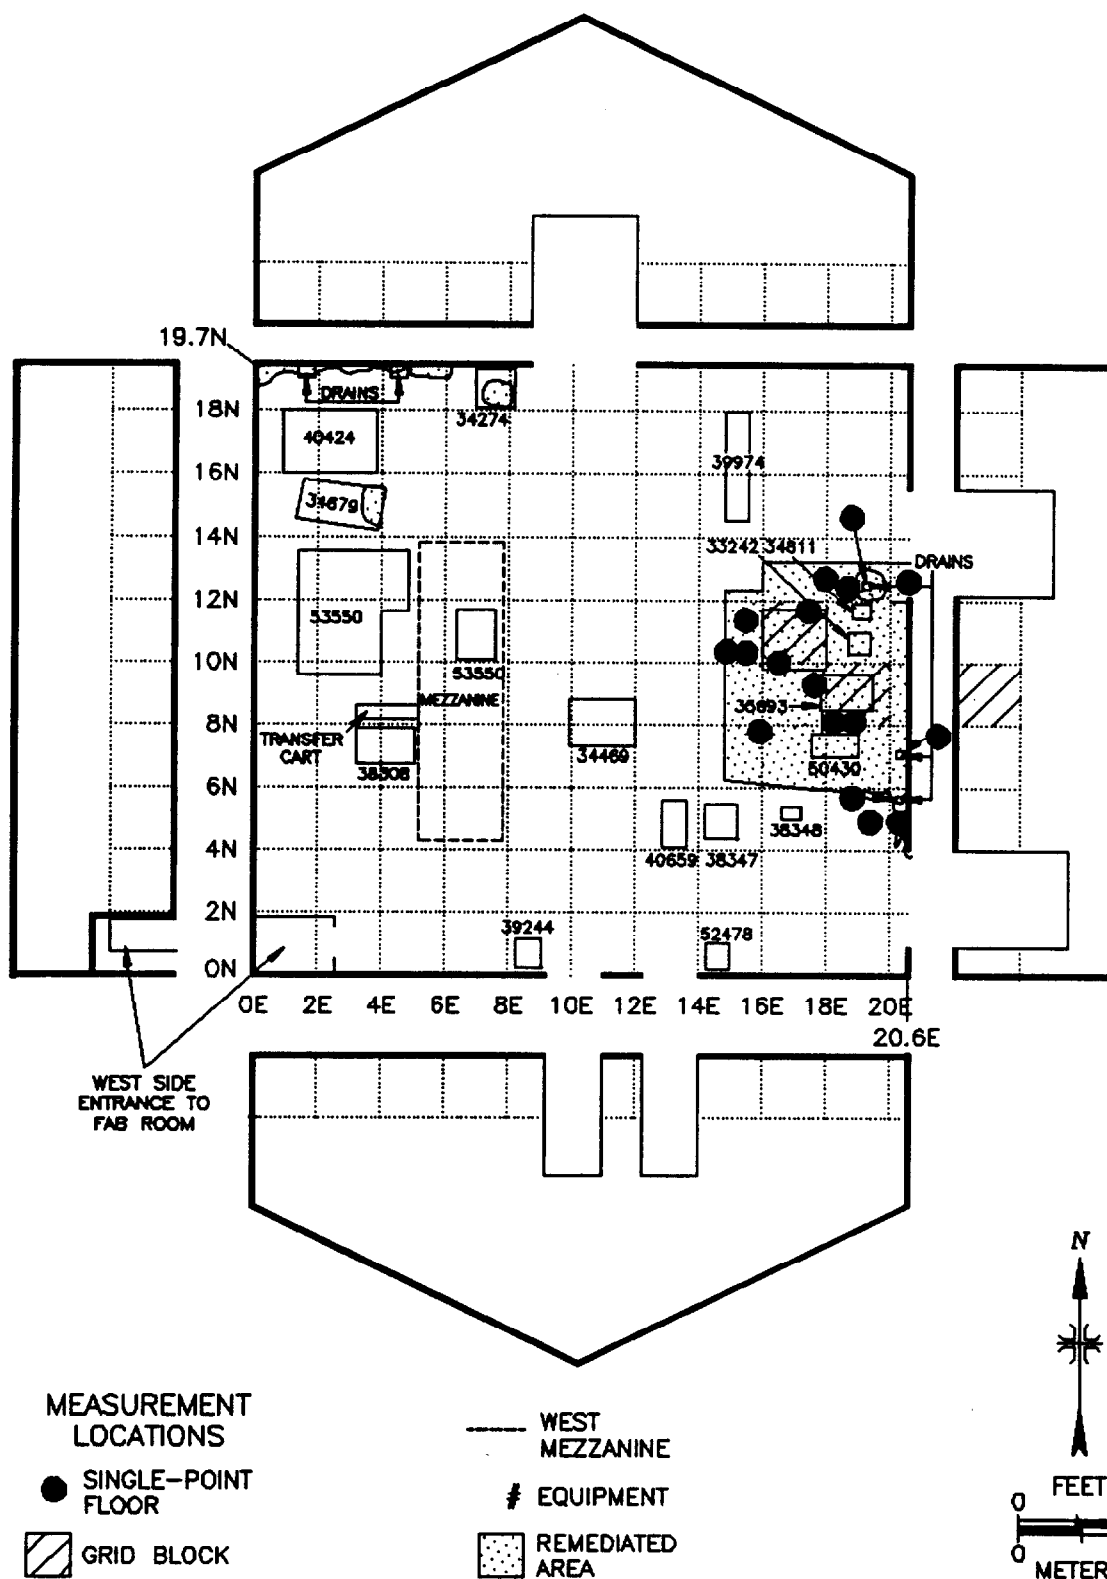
Building 30, Fabrication Room East Floor and Wall Equipment Locations – Remediated Areas and Measurement Locations
